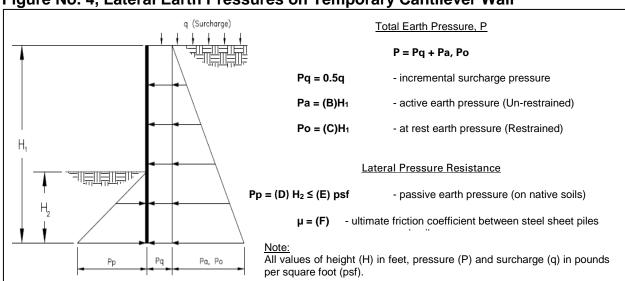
, Lateral Earth Pressures on Temporary Cantilever Wall
